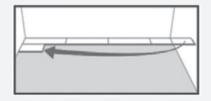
General distances between short ends Minimum distance between short ends of planks in parallel rows shall not be less than 500mm. This is for stability of the floor.
